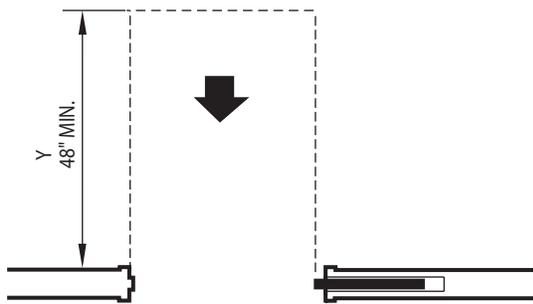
A-8D—FRONT APPROACH - SLIDING DOORS AND FOLDING DOORS
